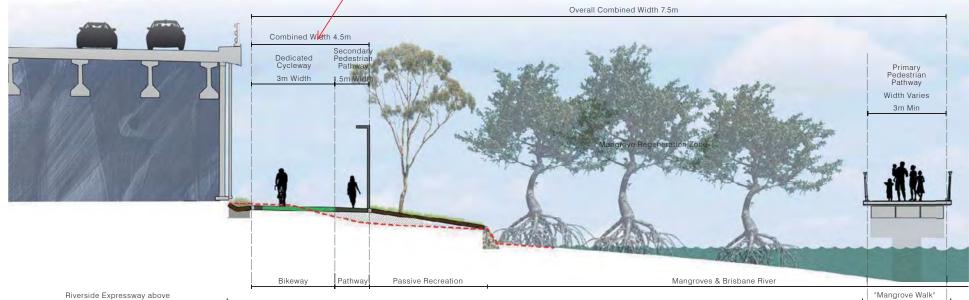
Goodwill Extension Type 3 Sectional Elevation (Not to scale)
